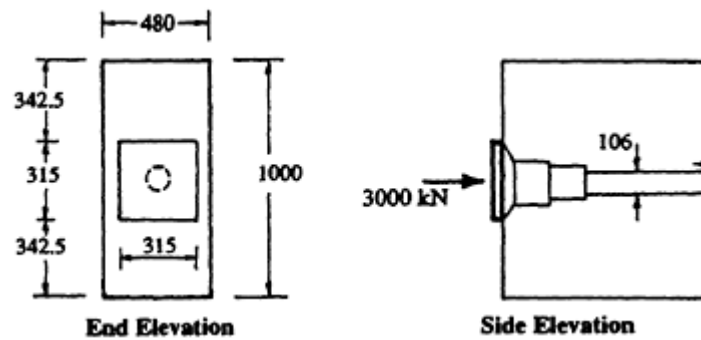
Anchorage zone arrangement in [Example 6.1](#)
